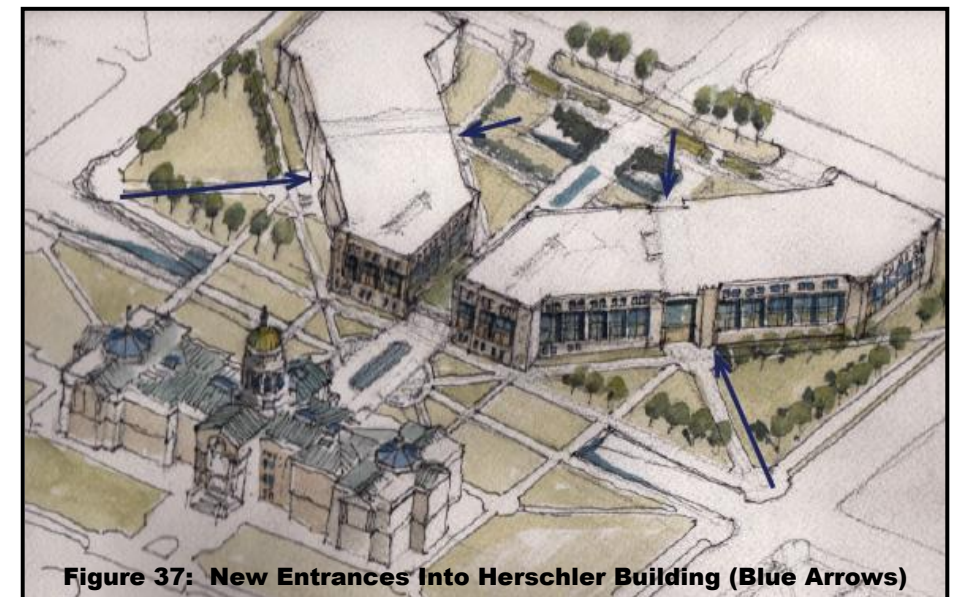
New Entrances Into Herschler Building (Blue Arrows)
